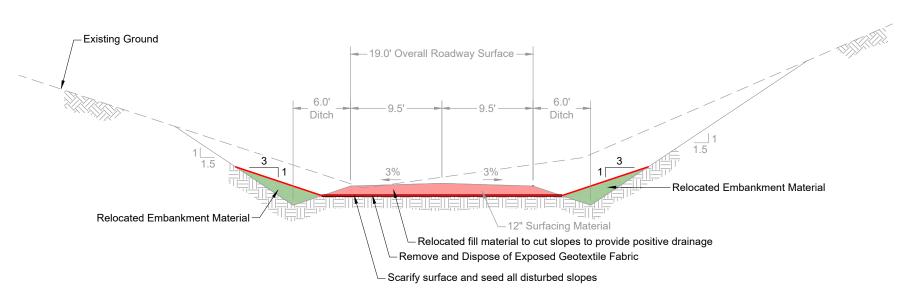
illustrates proposed reclamation details for the access road while Figure 8 illustrates the proposed details for bridge and culvert reclamation.
